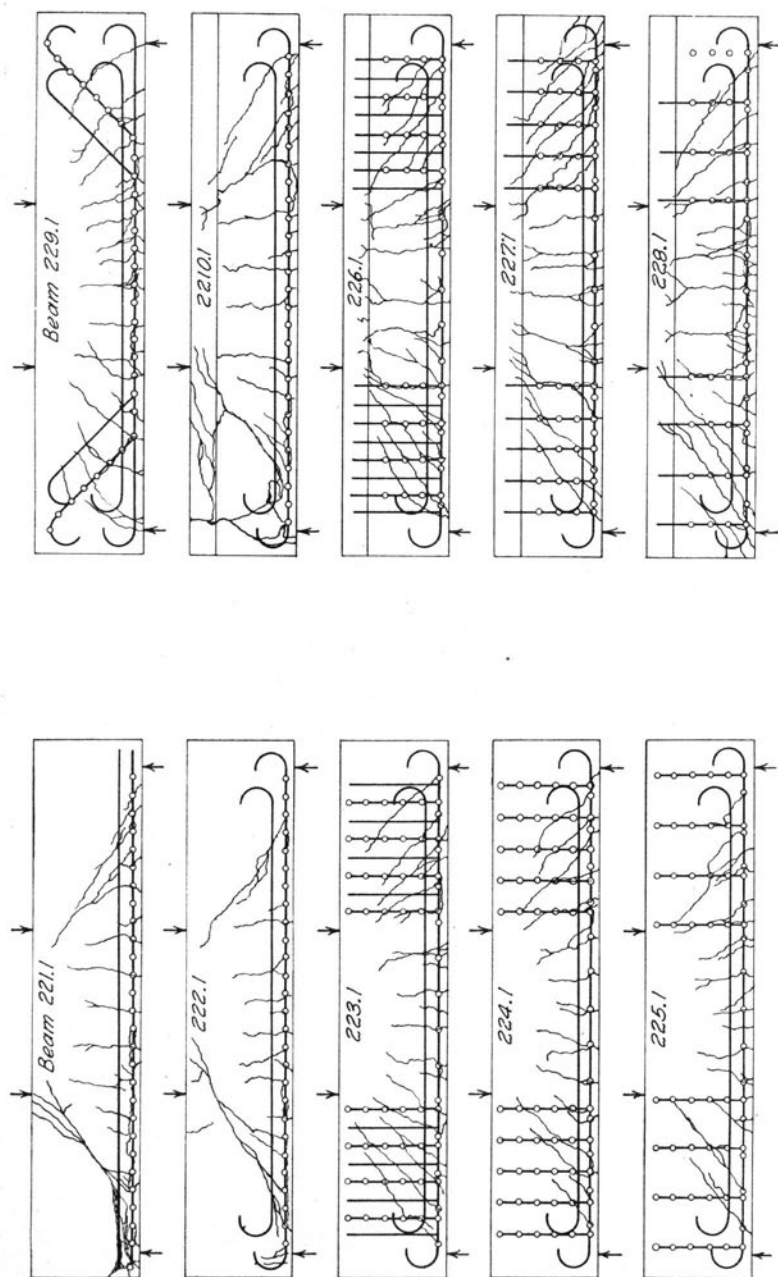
SKETCHES OF TYPICAL BEAMS AFTER FAILURE, SERIES OF 1922
